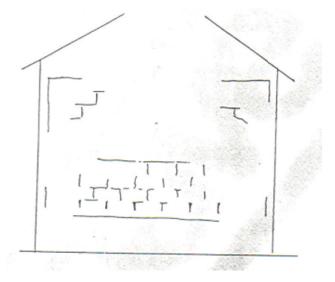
Cracking of coating in masonry blocks that are insufficiently dry
